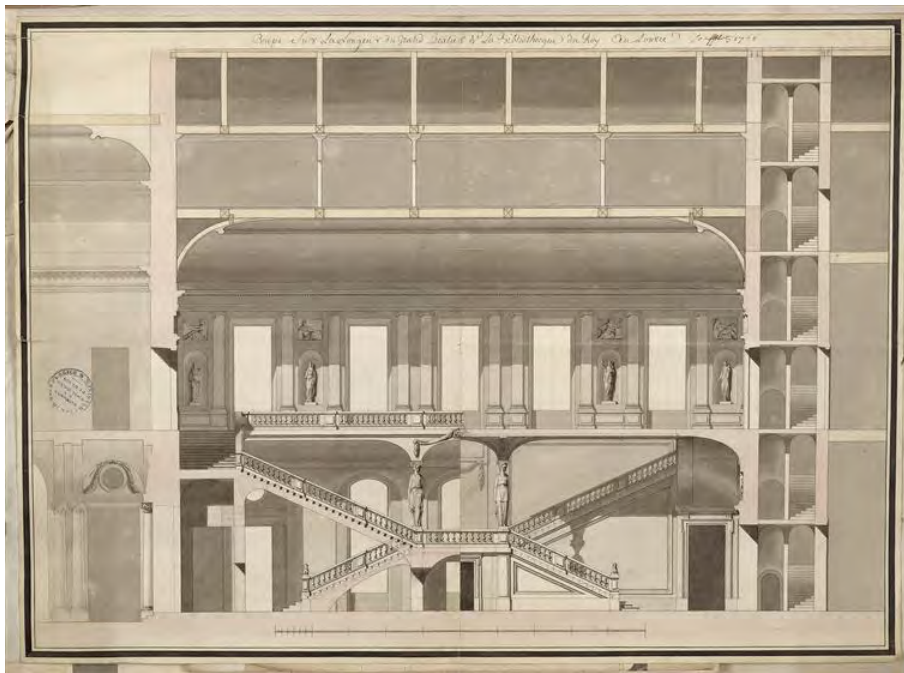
Section of Soufflot's staircase in Louvre. Source: www.photo.rmn.fr
